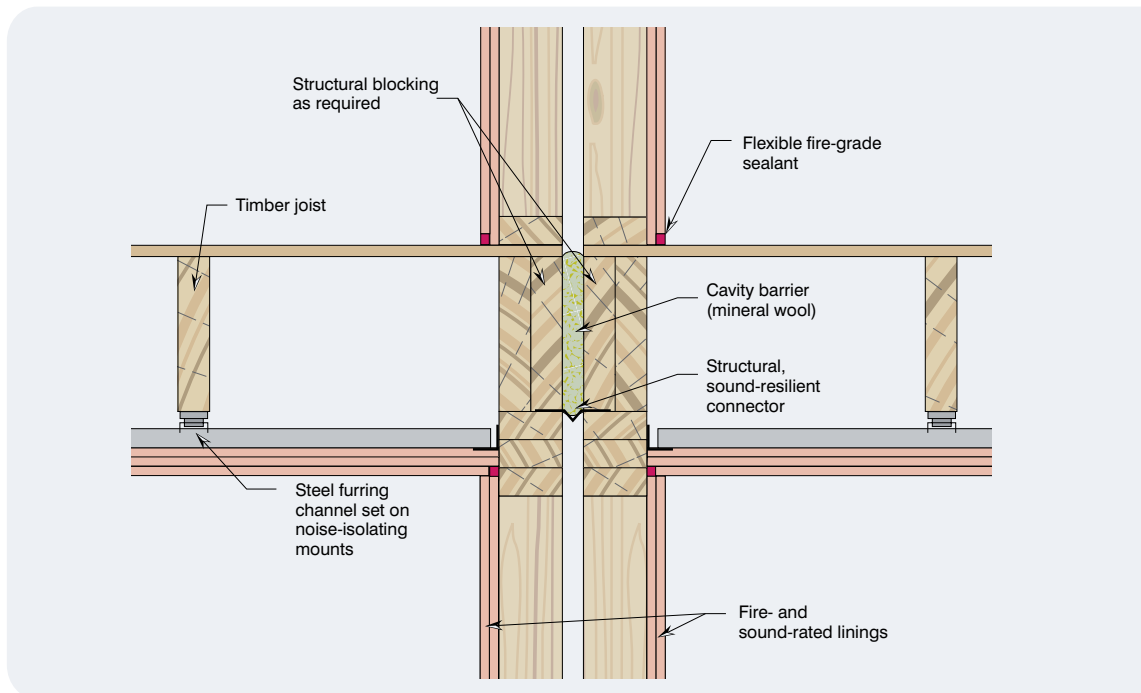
Joists running parallel to bounding wall – elevation view.
